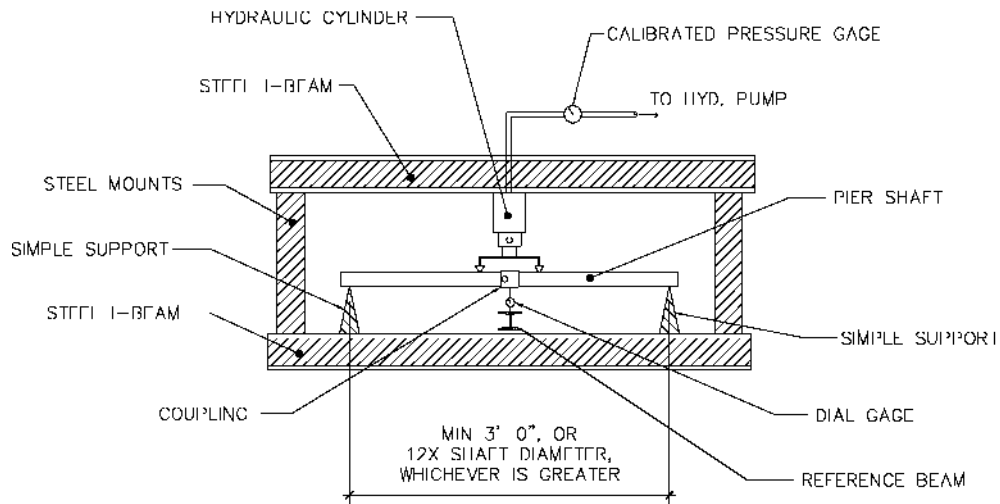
SEGMENTED PIPE SECTION BENDING EXAMPLE LABORATORY TEST SETUP
